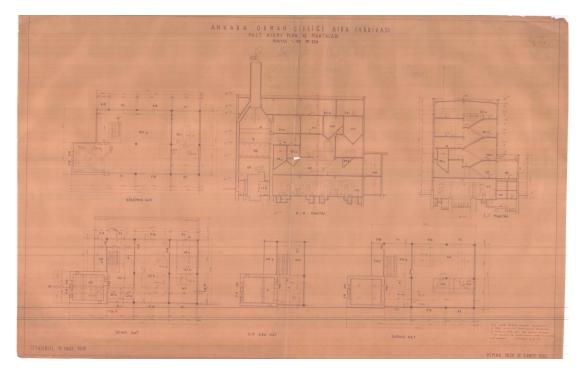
Drawing of the malt building which was revised two months later, No: 226, Plans and Sections, Ernst Egli, 11.03.1937 (Source: TTA Archive)
